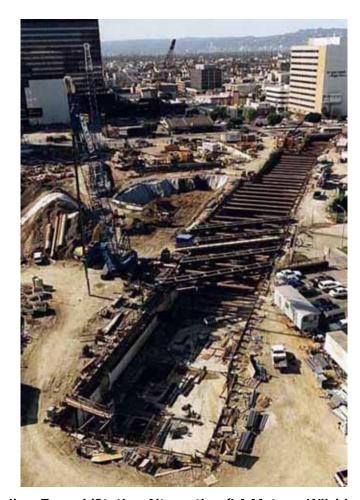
Shallow Tunnel/Station Alternative (LA Metro – Wilshire to Vermont)
